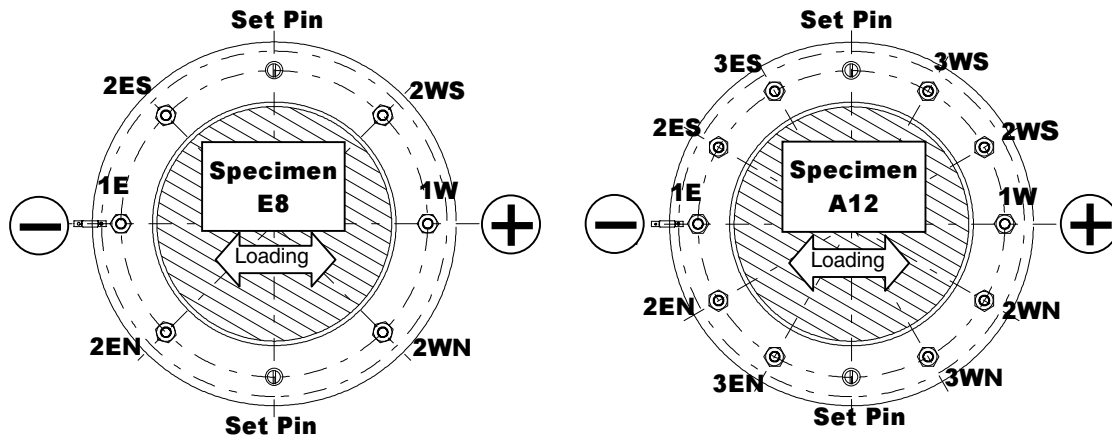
Layout of Bolts and Set Pins at Lower Flange
